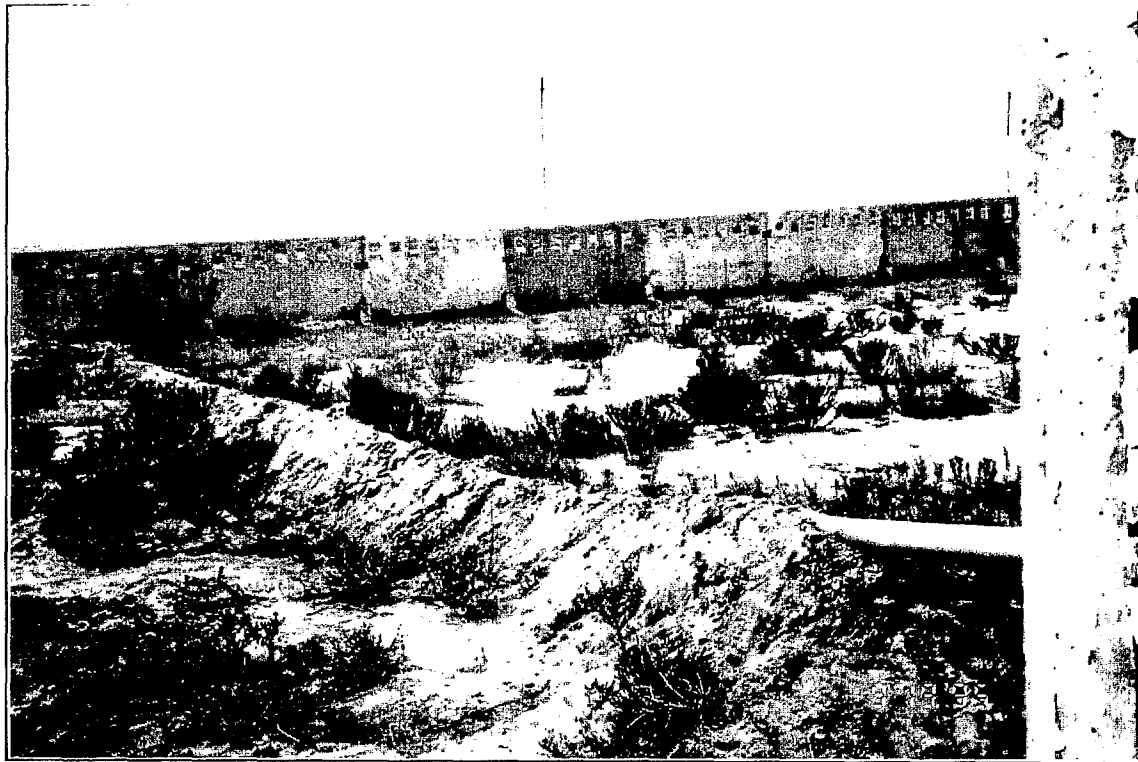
Waste water discharge line leading from pumphouse. Discharge is onto ground surface on opposite side of concrete wall in background.
